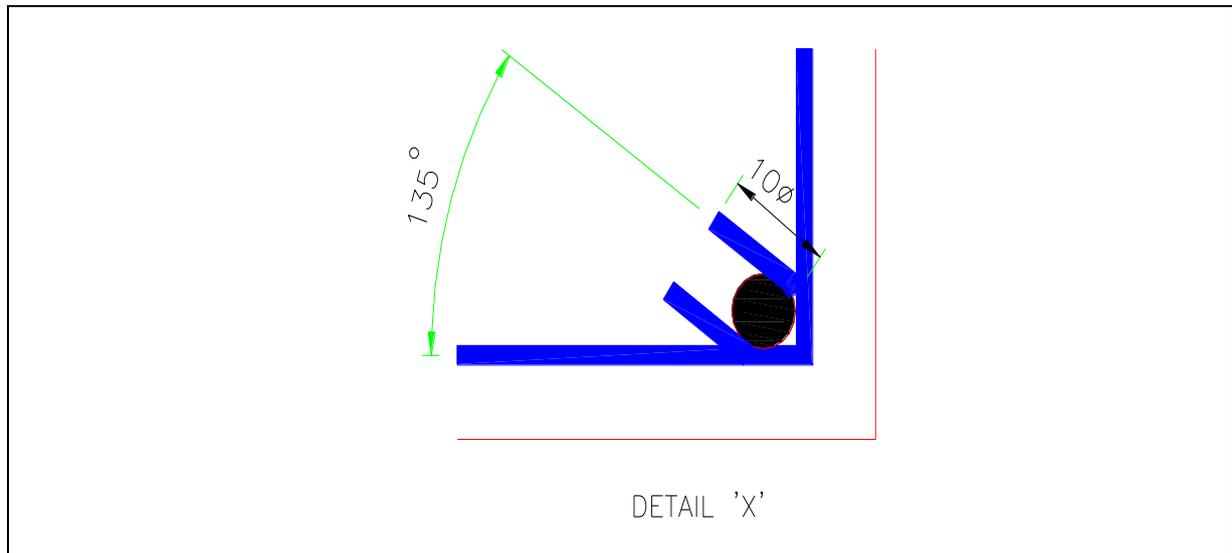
Reinforcement Jacket detailing for minimum level of retrofit
